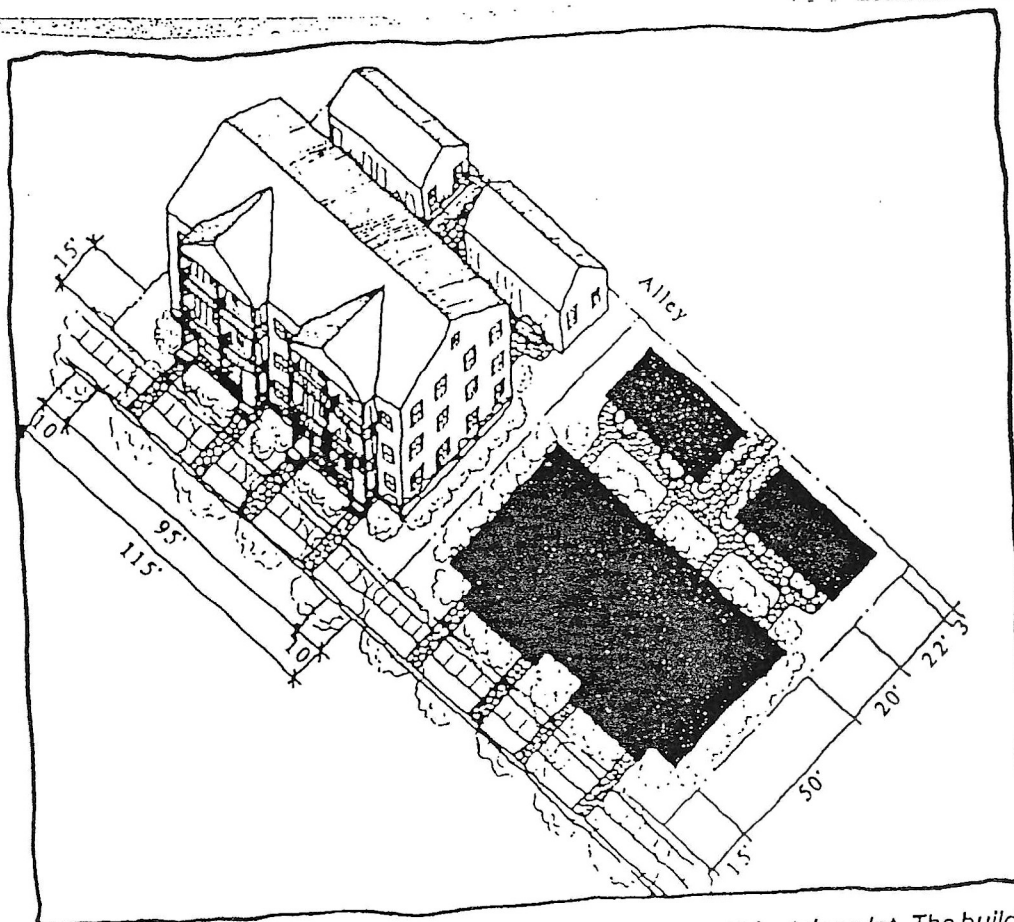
Figure ground and axonometric of an apartment building on 110 foot deep lot. The building contains 9 units. There are garage spaces for one car per unit.
